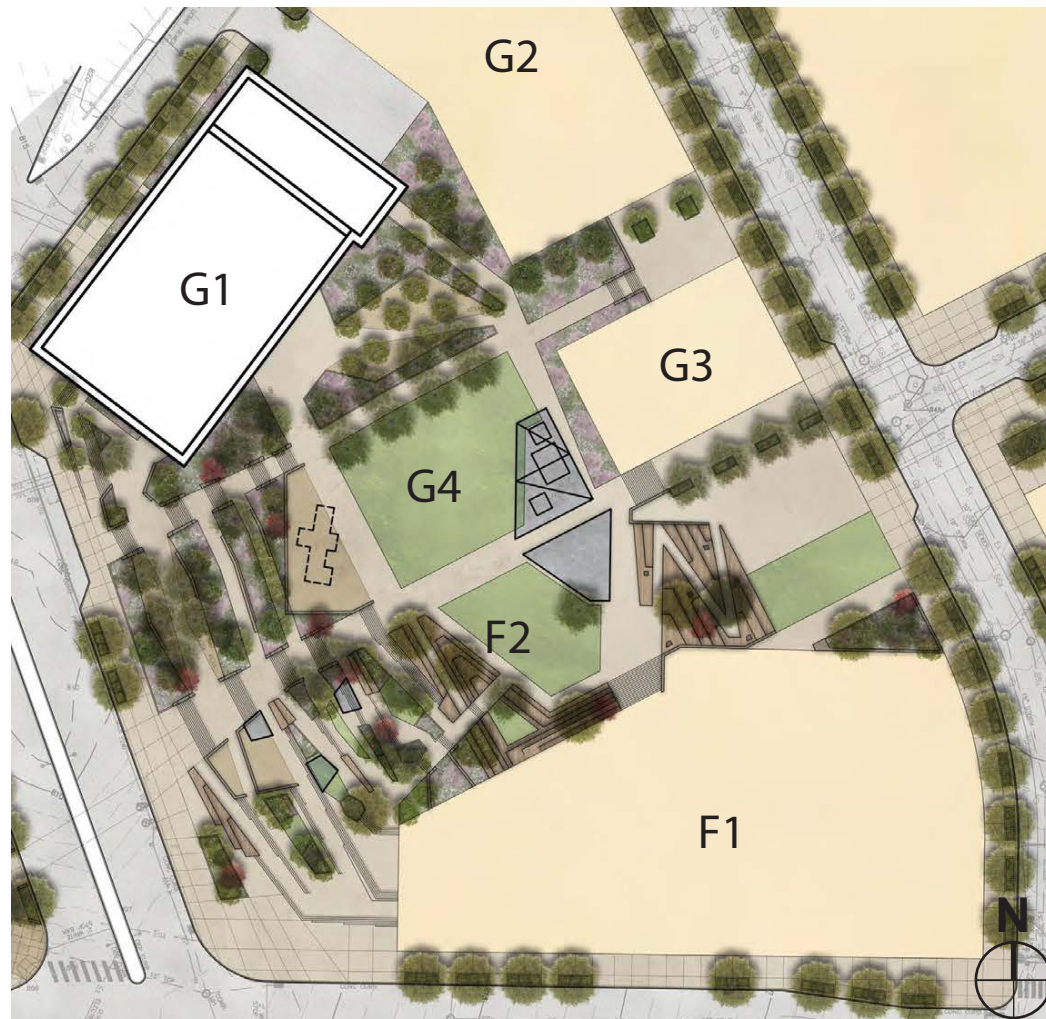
Enlarged illustrative plan showing the layout of open space in Block F and G
